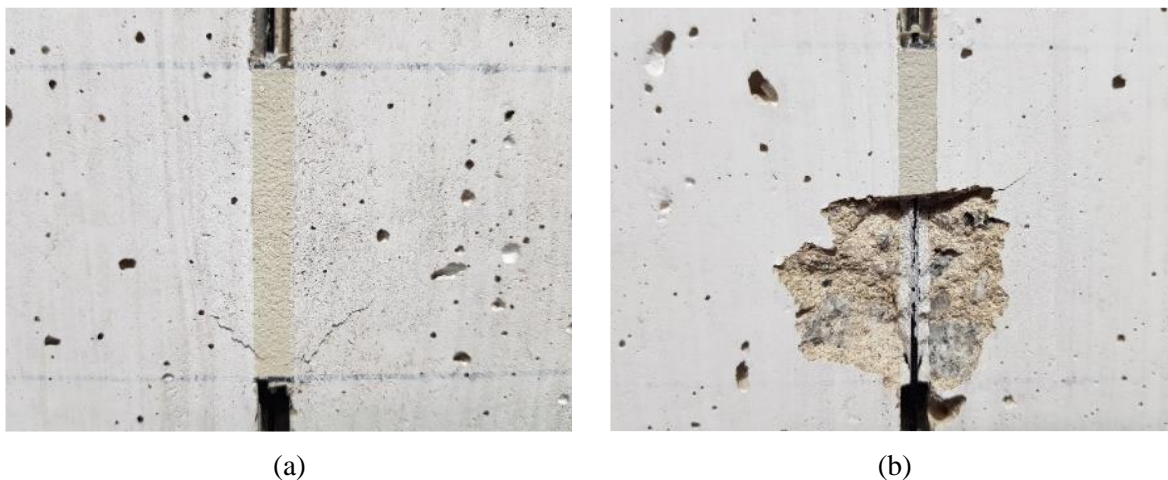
Typical failure modes dominant in bond NSM tests: (a) debonding failure at laminate-adhesive interface with concrete cracking – F/A + CC and (b) debonding failure at laminate-adhesive interface with concrete splitting – L/A + CS.
